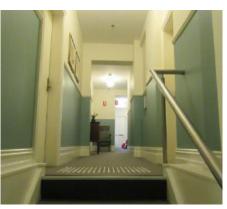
The second floor opening from 139-141 George Street (2.19) was made during the 2010-2011 works. Source: TKD Architects 2020.
